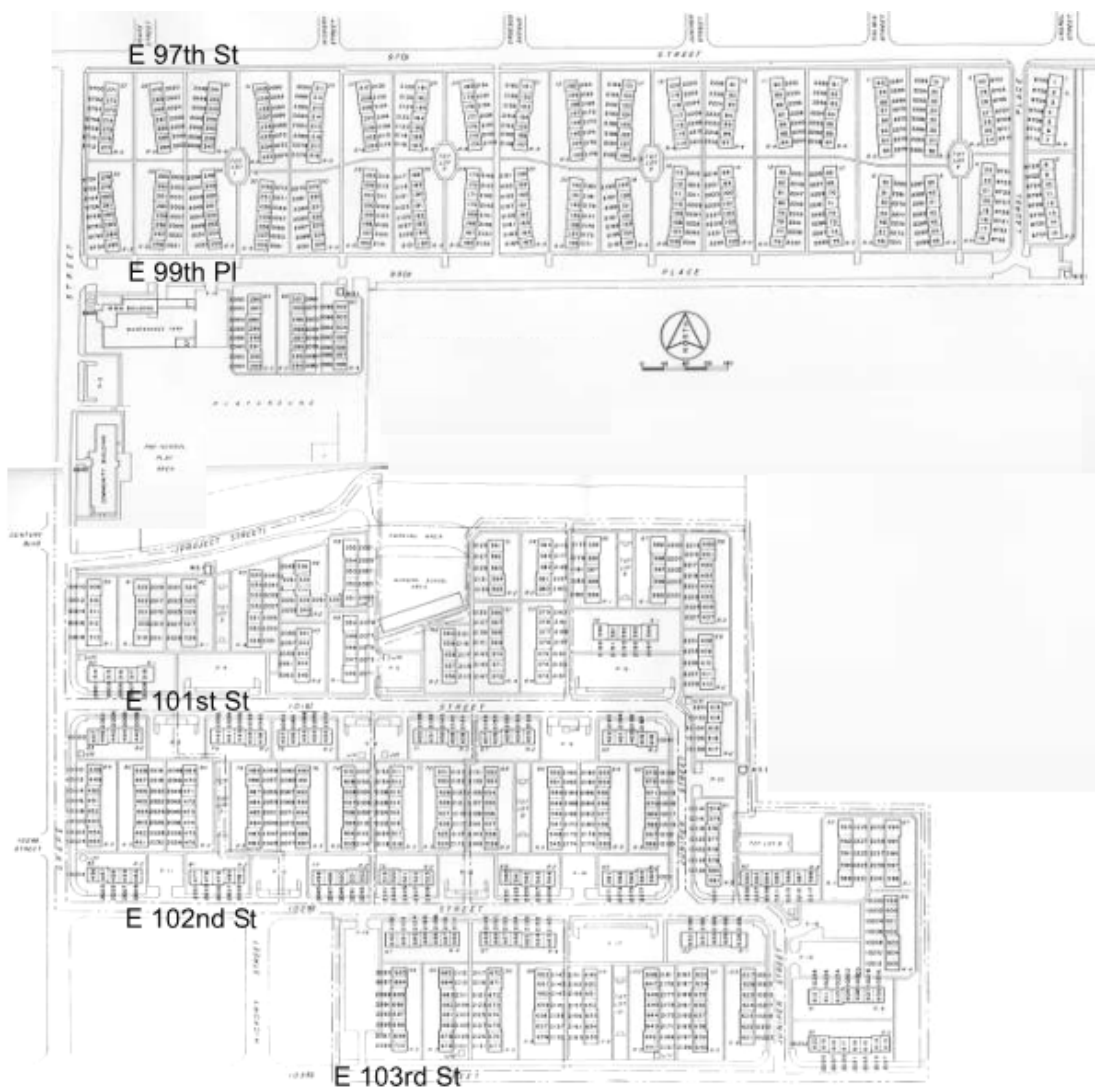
Compiled, annotated overall plan of Jordan Downs. Image compiled from two plans, Unit and Housing Numbering Map for Jordan Downs, August 1956 (north of East 99th Place) and Jordan Downs Water and Gas Meter Plan, no date. Note large Pre-School building arranged at angle in center (no longer extant, now Community Center). Source: both plans from Los Angeles Bureau of Engineering Vault.
